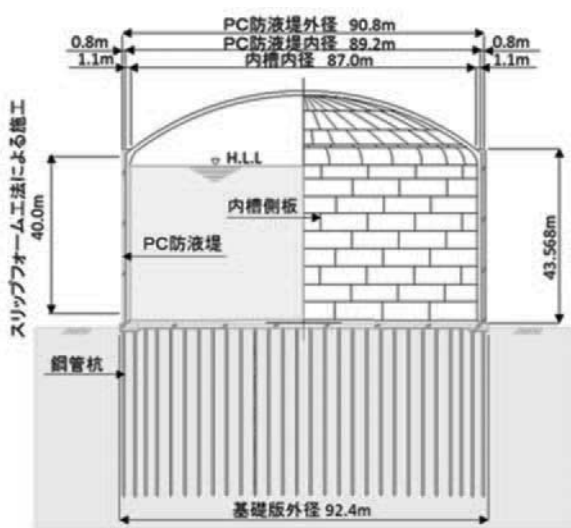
Sectional drawing of 230,000m³ PC LNG tank in Senboku LNG Terminal 1, Osaka Gas
